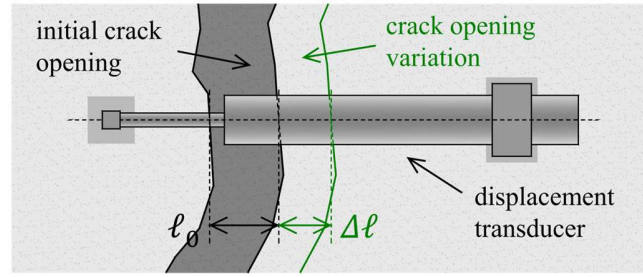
Scheme of the monitoring system for concrete crack opening considered in the application.
